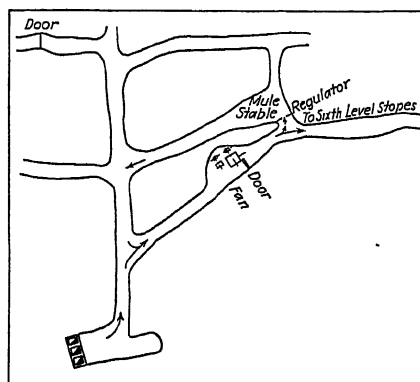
PLAN OF SEVENTH LEVEL STATION AND FAN SITE.
